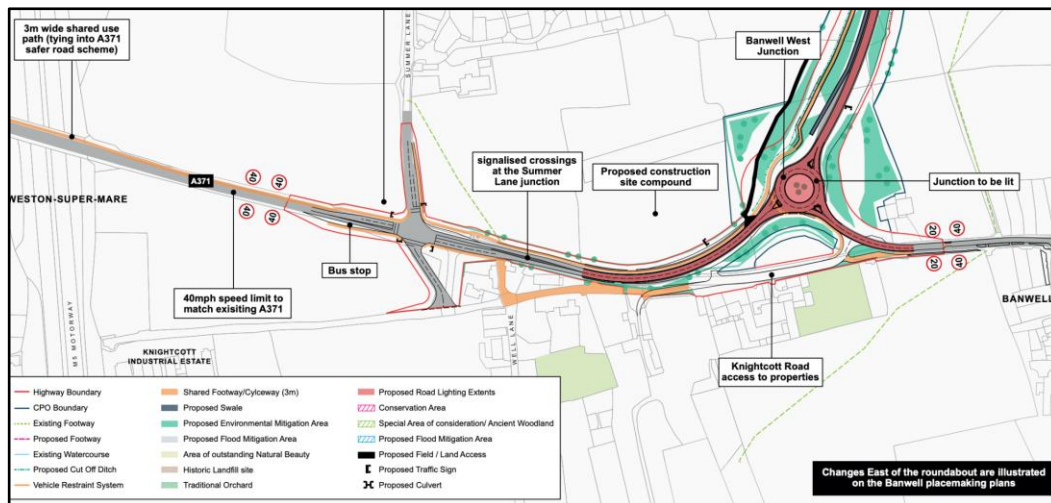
Simplified General Arrangement drawing for the proposed Summer Lane and Banwell West Junction section of the Banwell Bypass - 22/P1768/R3EIA Appendix 4 Transport Strategy
